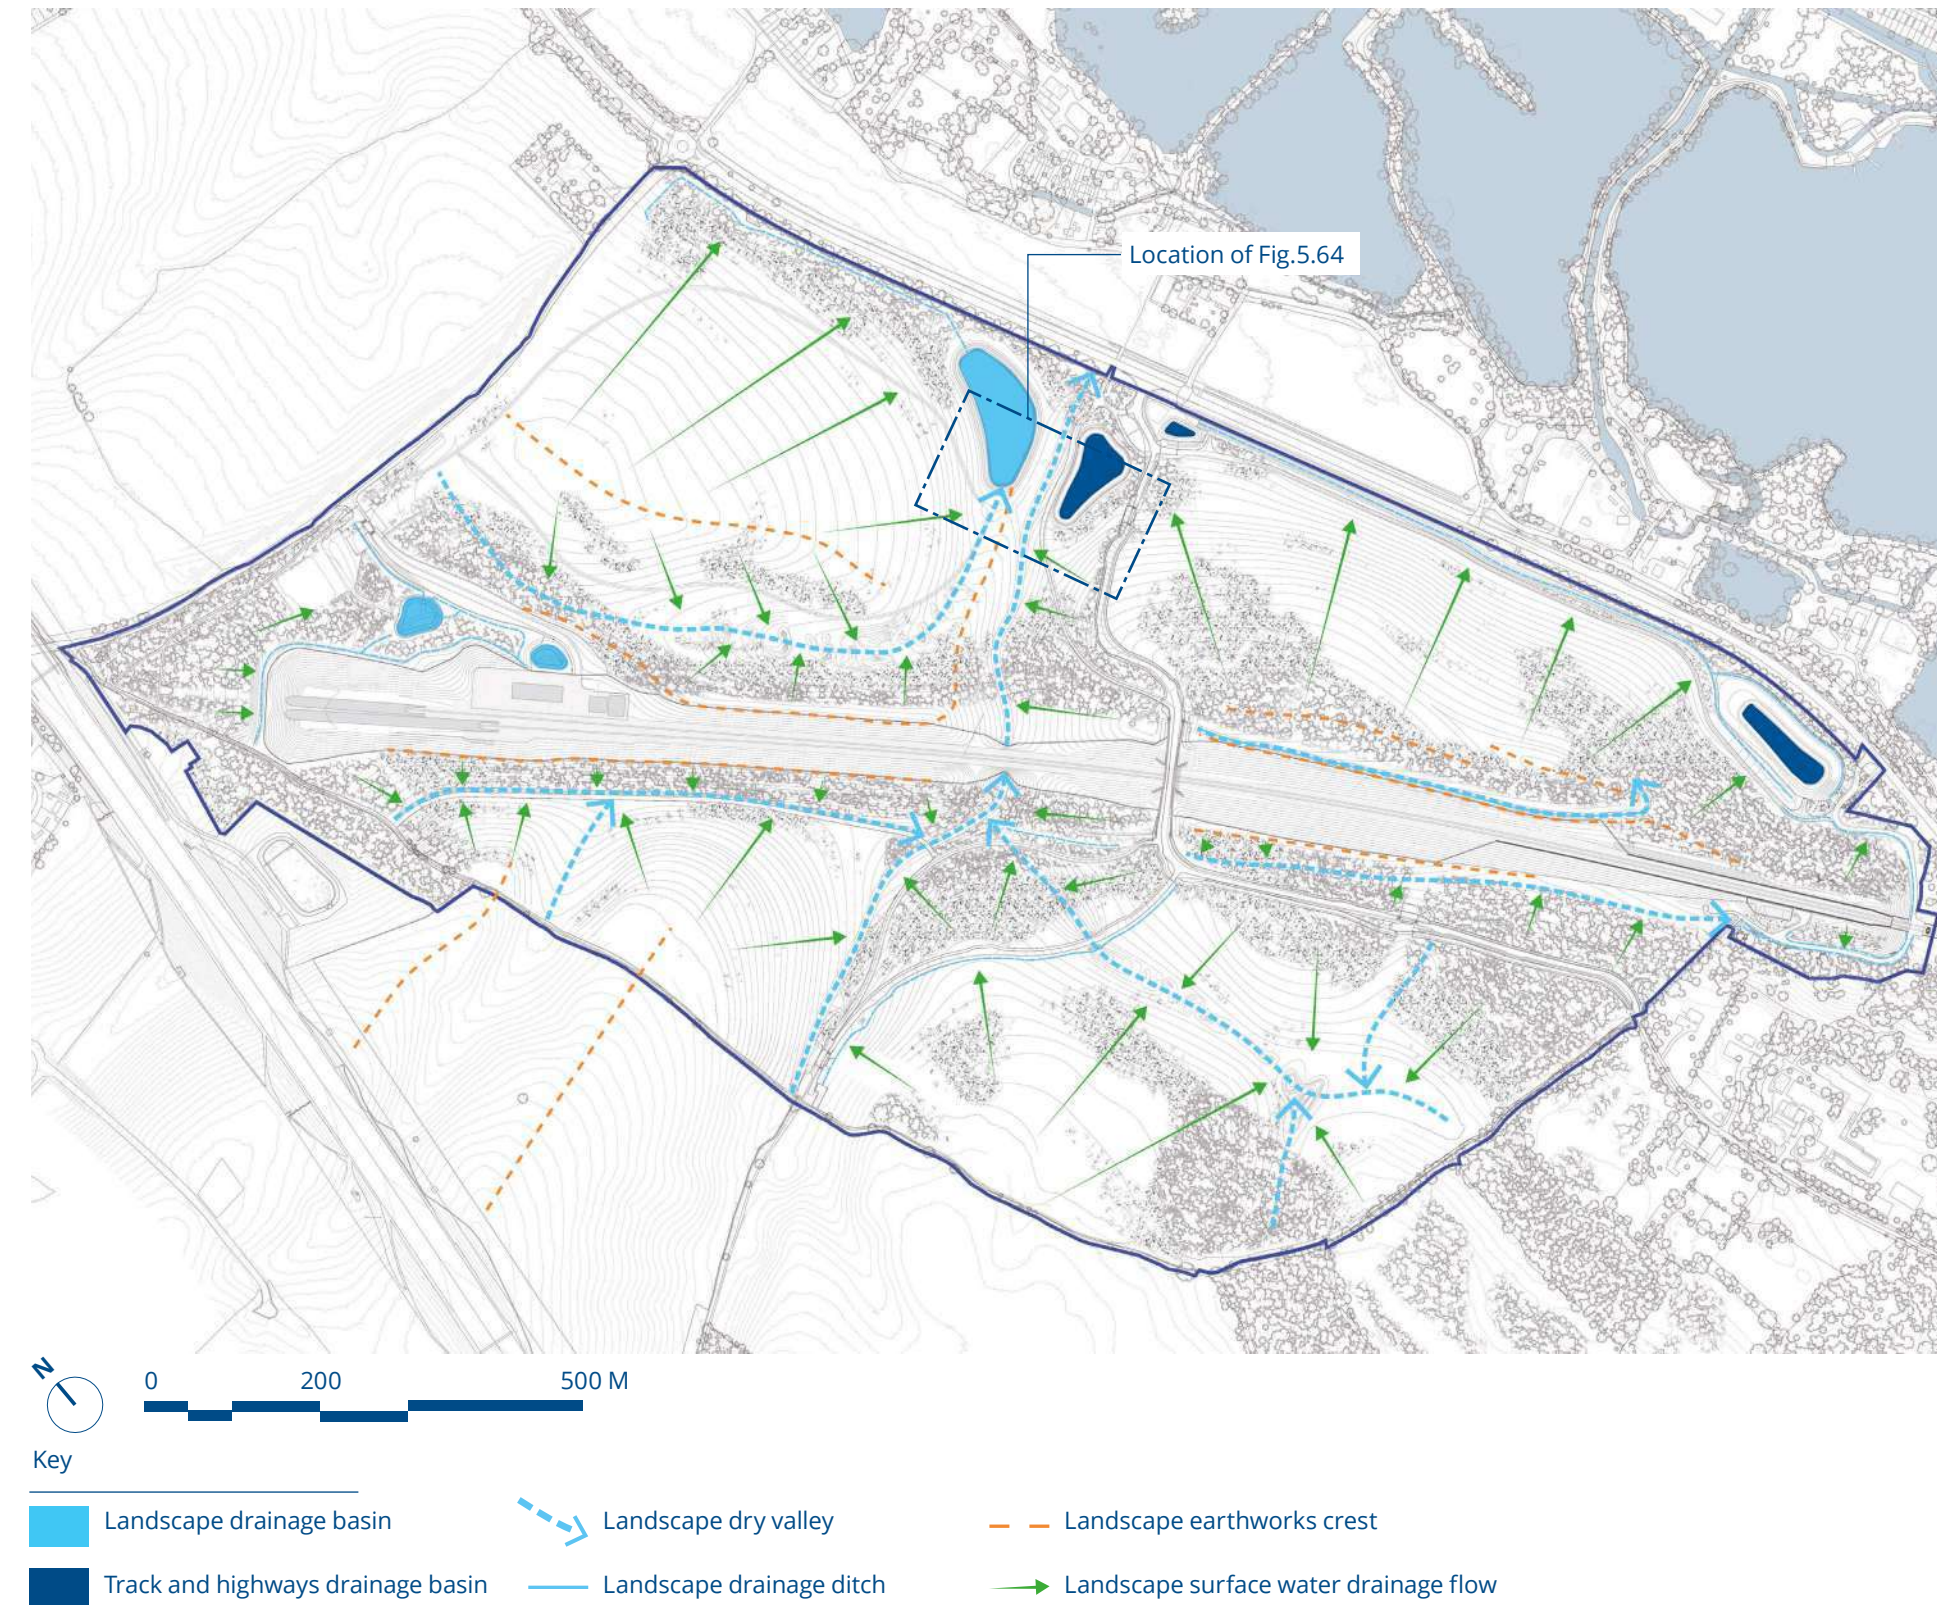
\_ Site plan - Track and landscape drainage strategy
